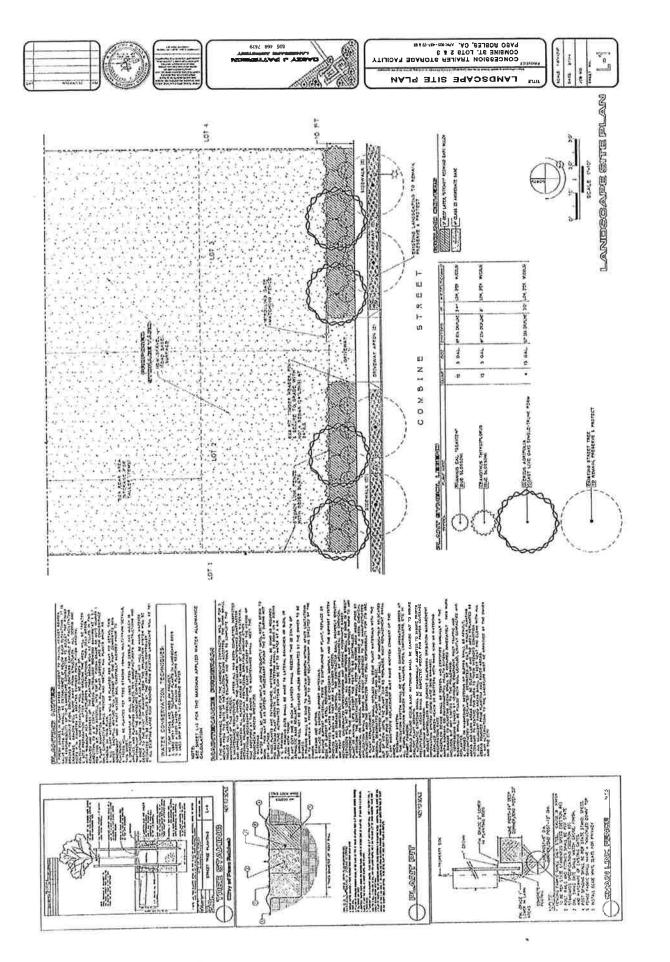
Exhibit A Site Plan / Landscape Plan CUP 14-002 & PD 05-012 Amend. (Sharp)
